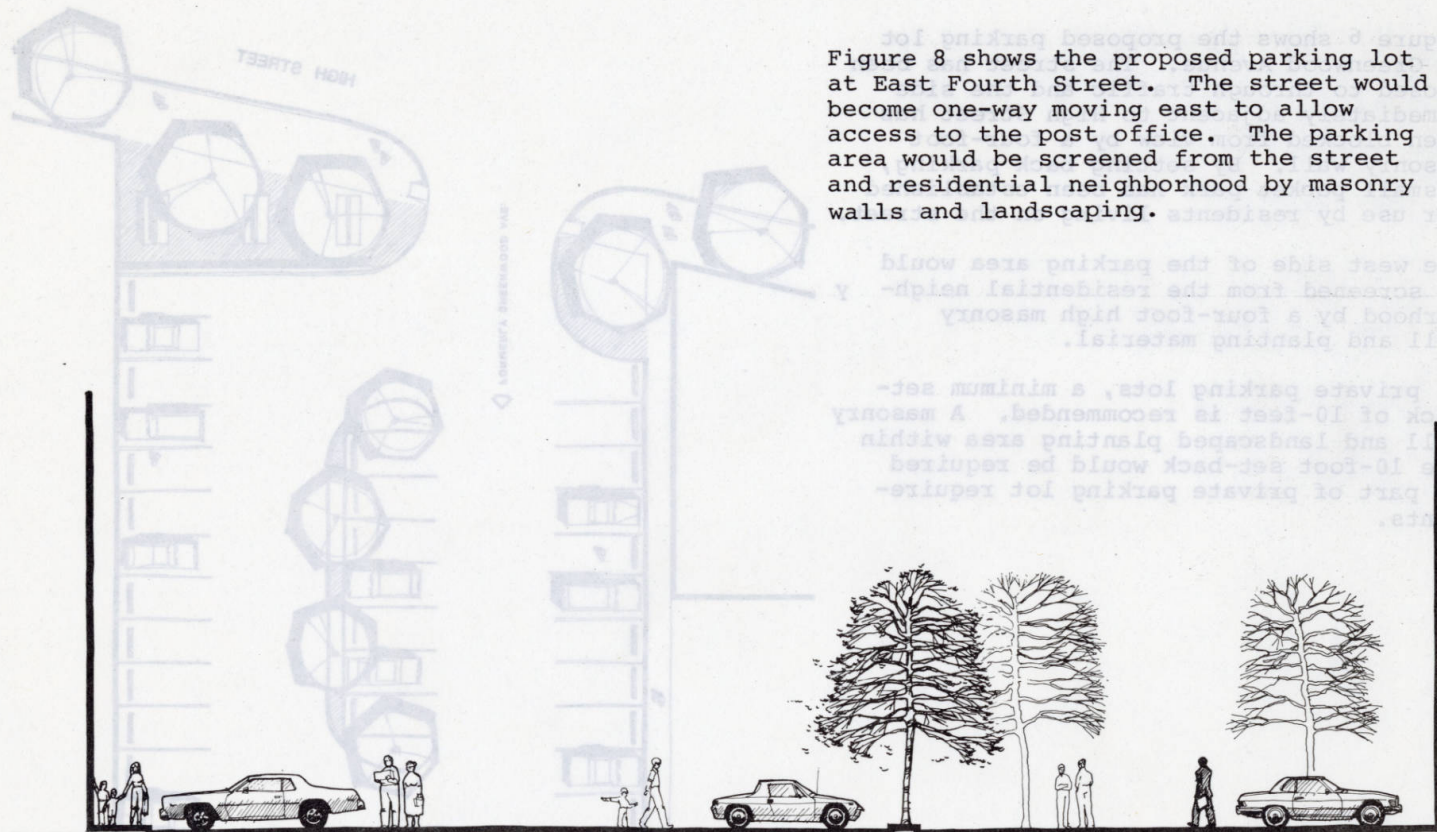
Proposed Off-street parking at Greenwood Ave.
